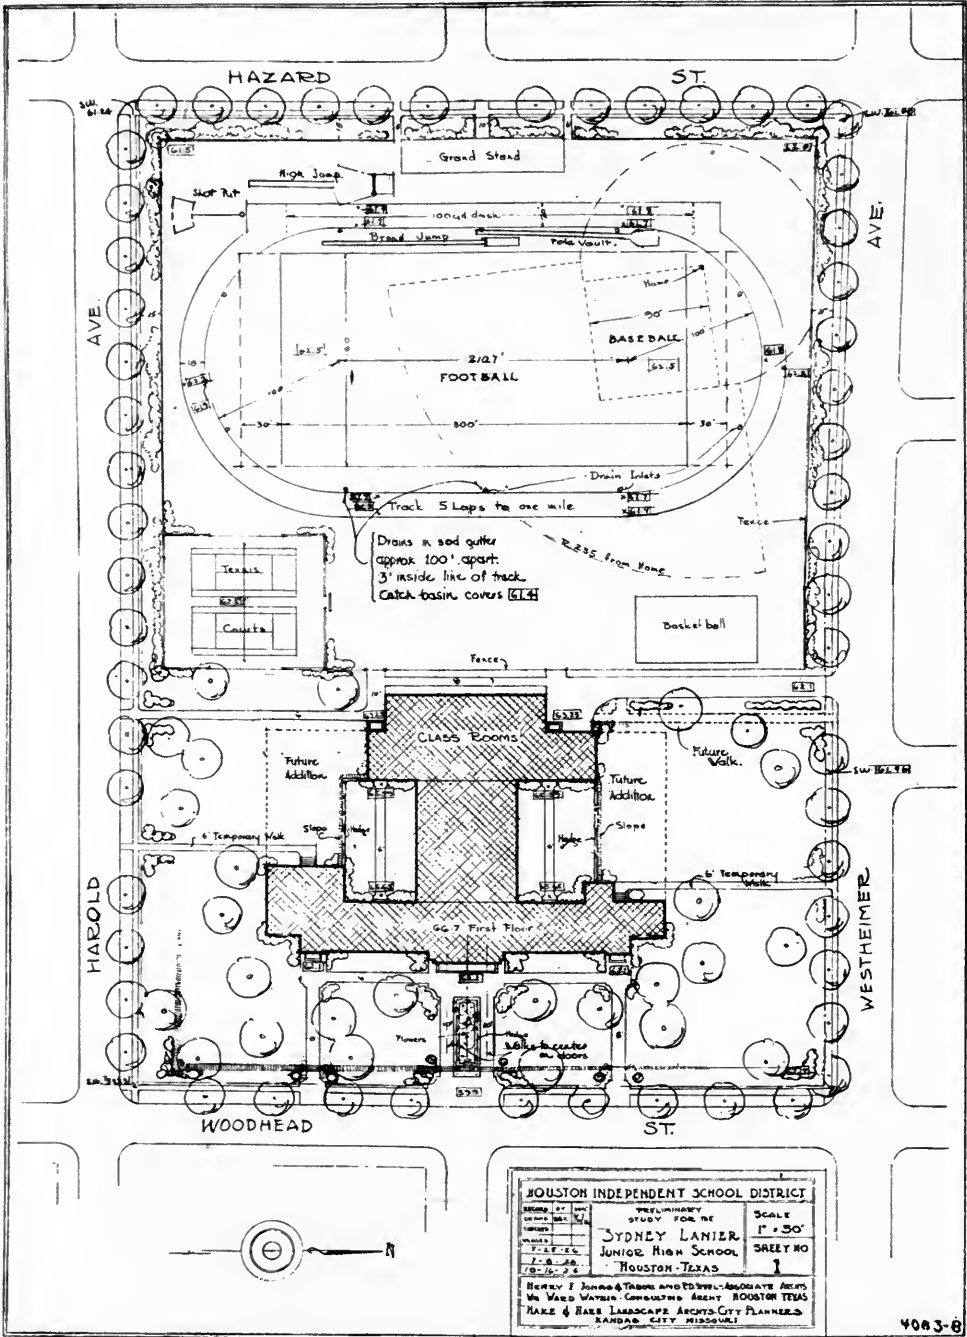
PLAN FOR THE DEVELOPMENT OF THE SIDNEY LANIER JUNIOR HIGH SCHOOL, HOUSTON, TEXAS
